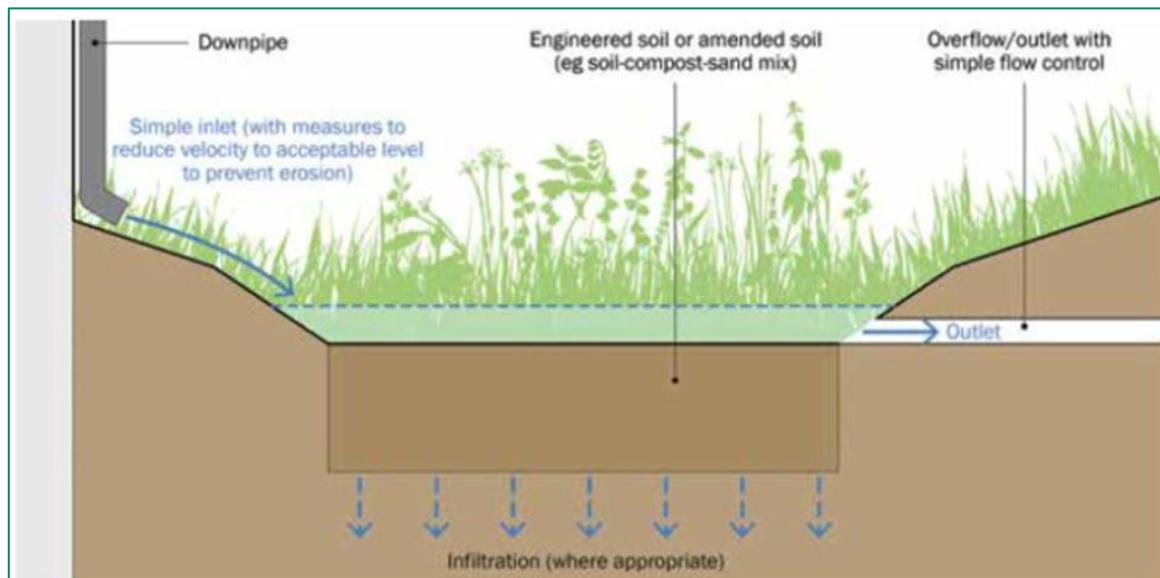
Typical Bio-Retention Section (Source: CIRIA C753 The SuDS Manual)
